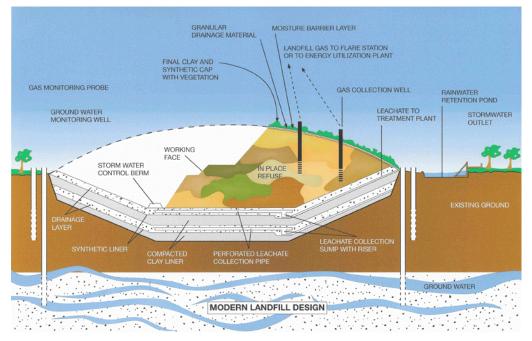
Landfill cross-section [www.runcoenv.com]
